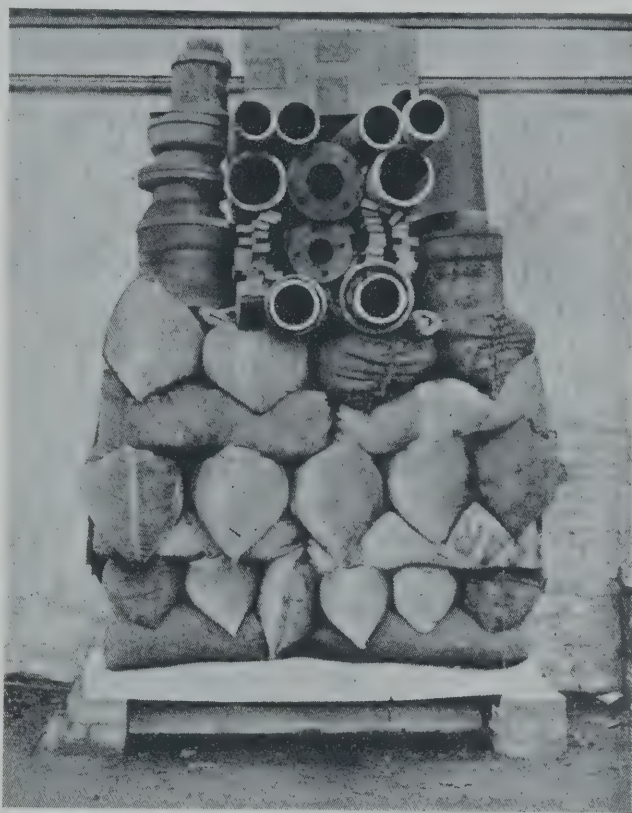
TEST ON SLAB REINFORCED WITH B.R.C. FABRIC REINFORCED WITH STIRRUPS.
